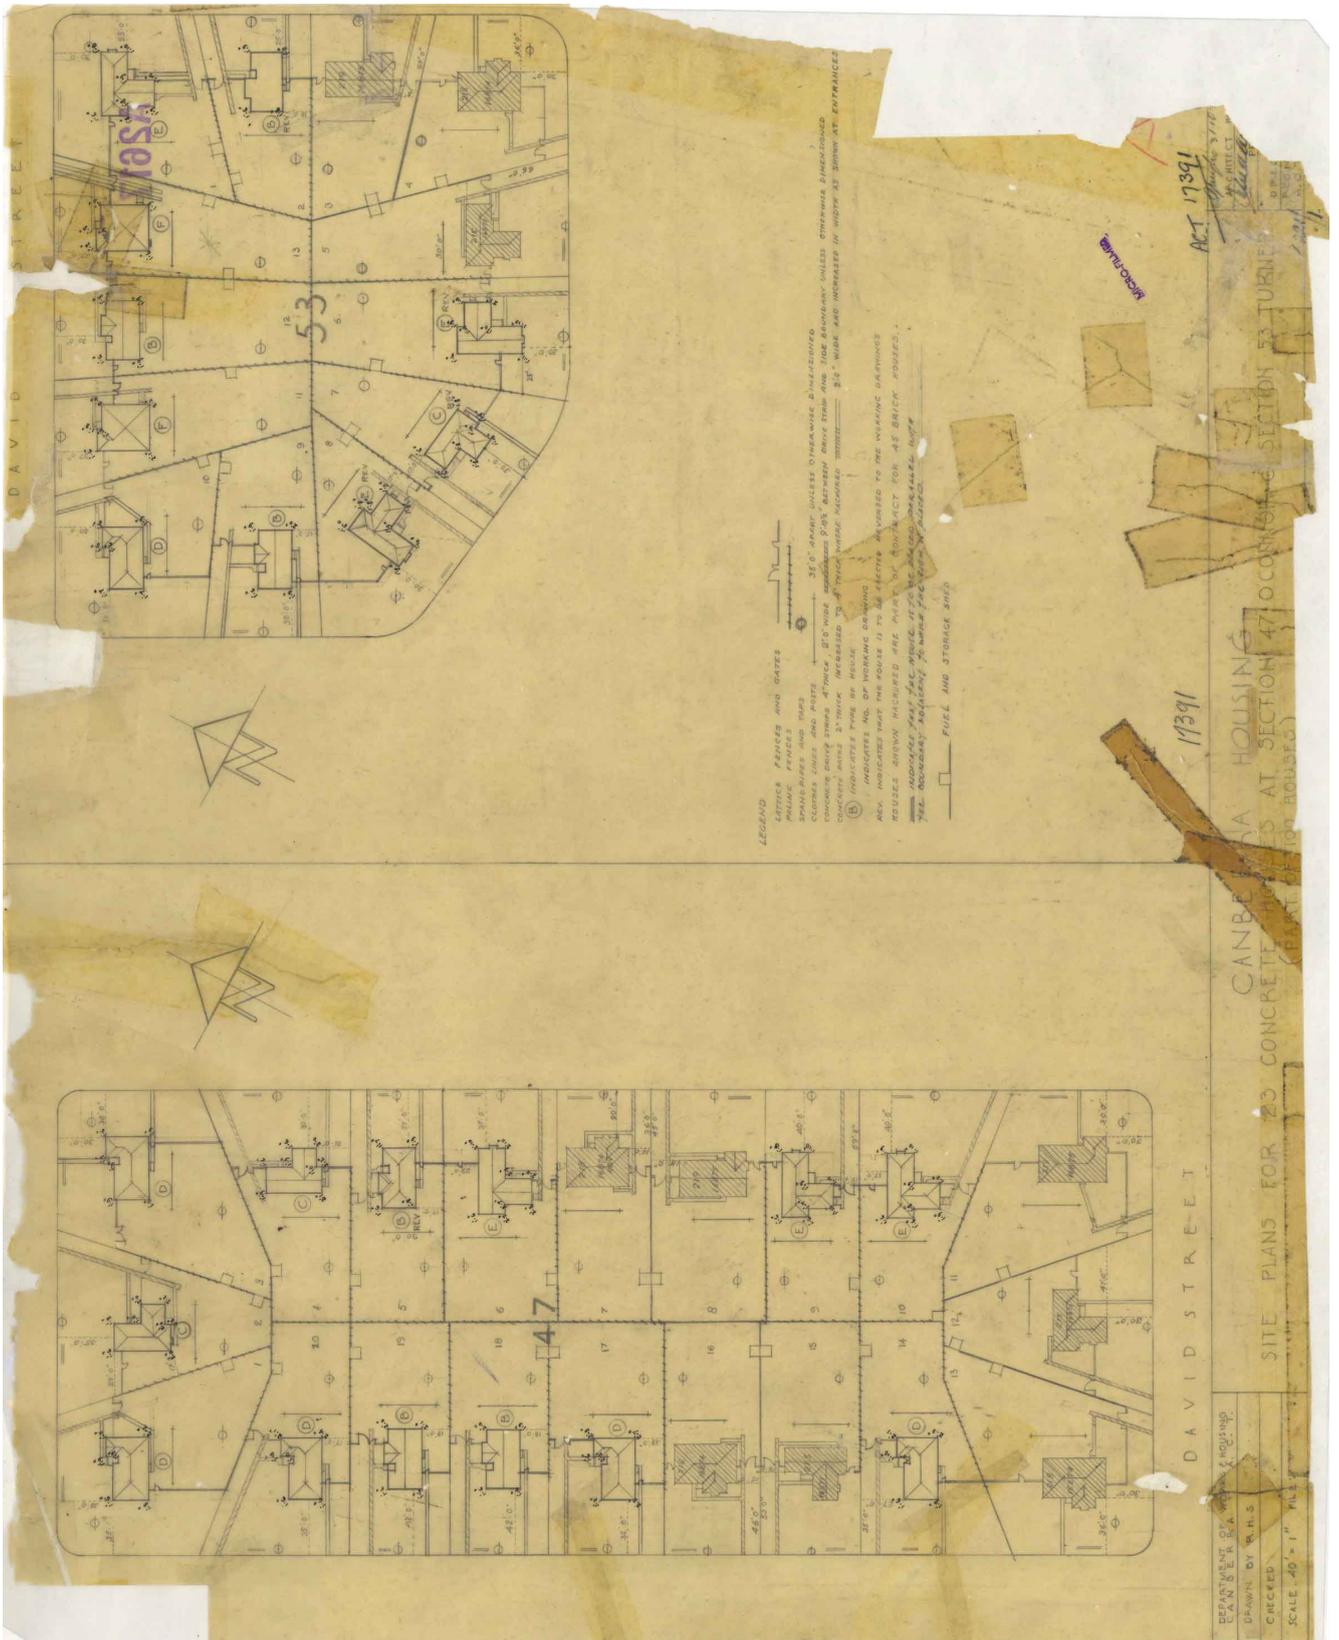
Plan drawings from the Department of Works and Housing showing house styles 'B' 'C' 'D' and 'E.'
